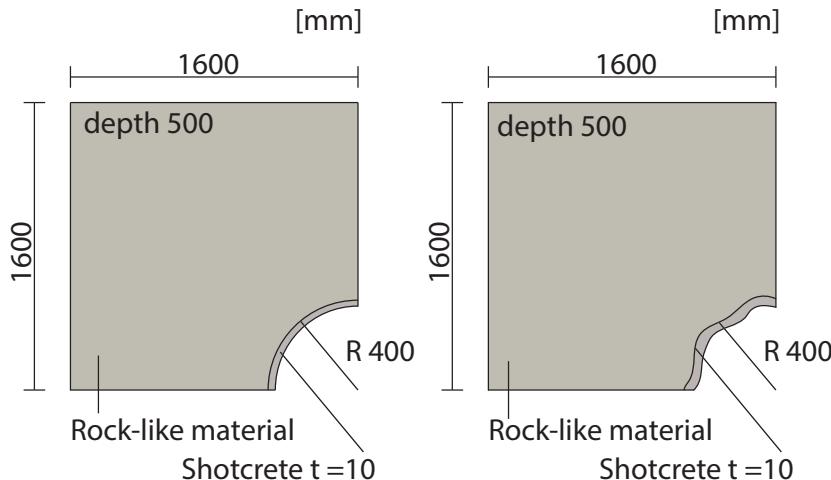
Modelling of irregular shotcrete linings and placement of rock bolts by Nilsson [77].
